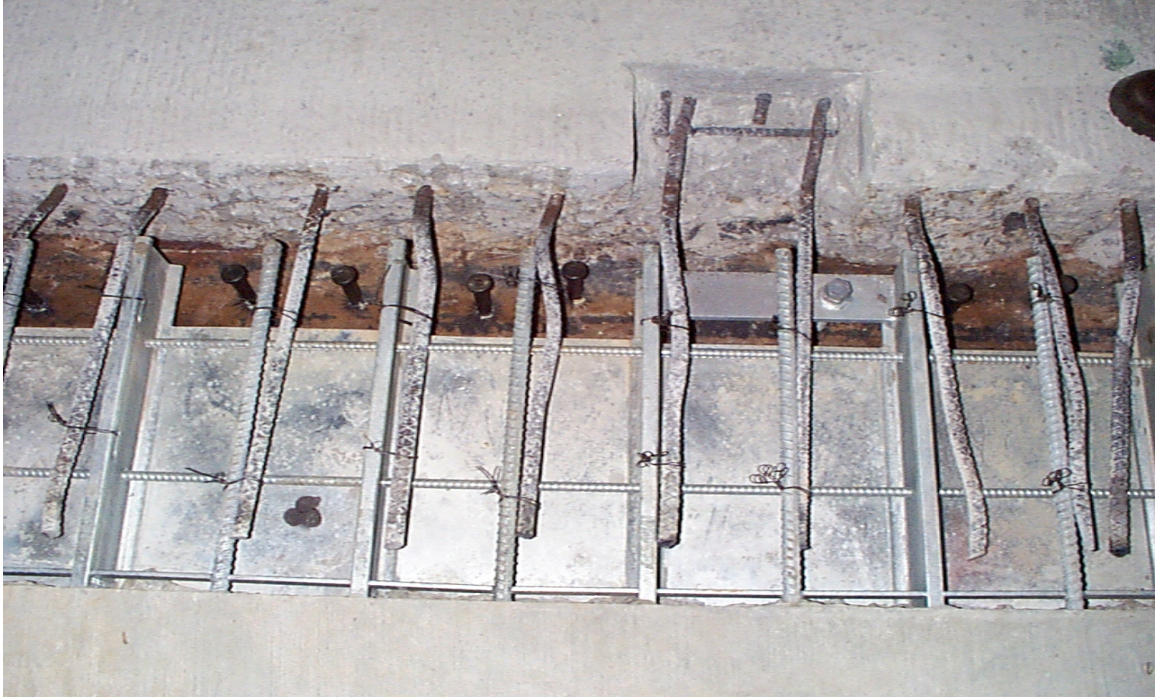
Plan View of the Existing Rebar and Lapping Details
